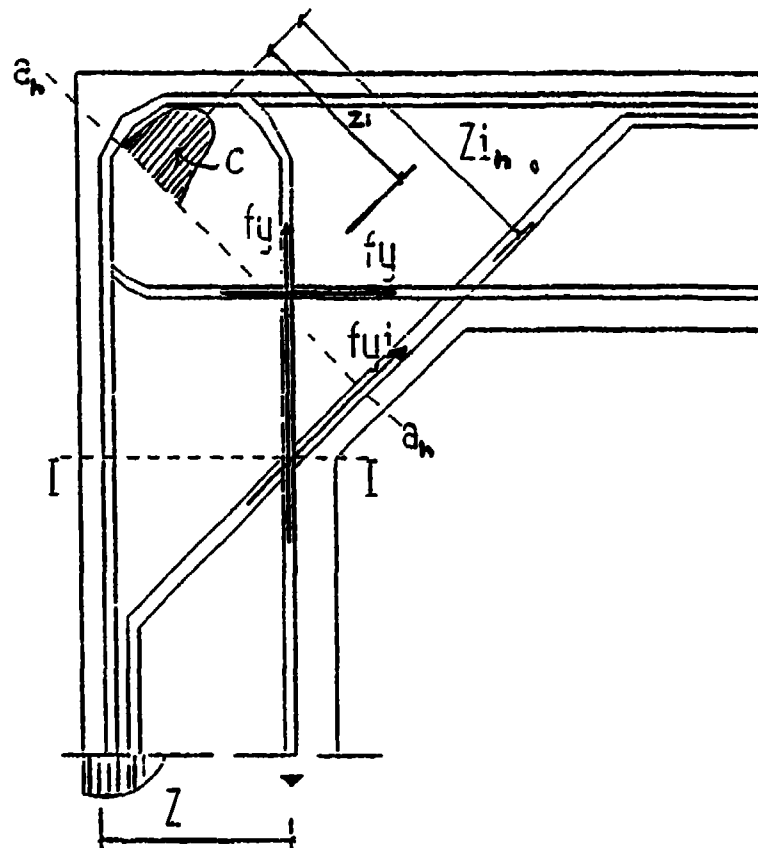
Internal force system in the developed corner with haunch reinforcement detail.
